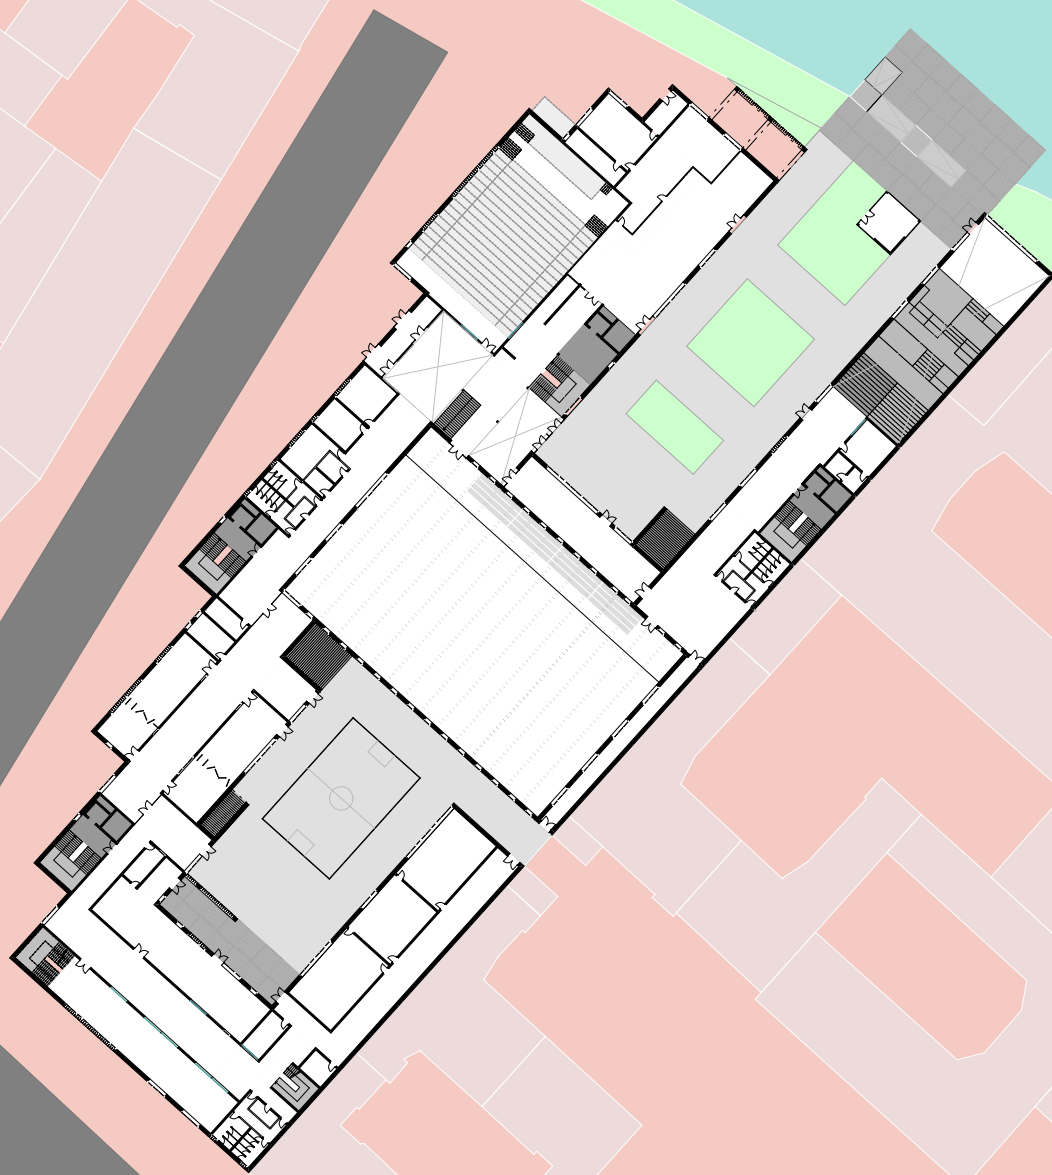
groundfloor (0), floor plan, scale 1:1000
